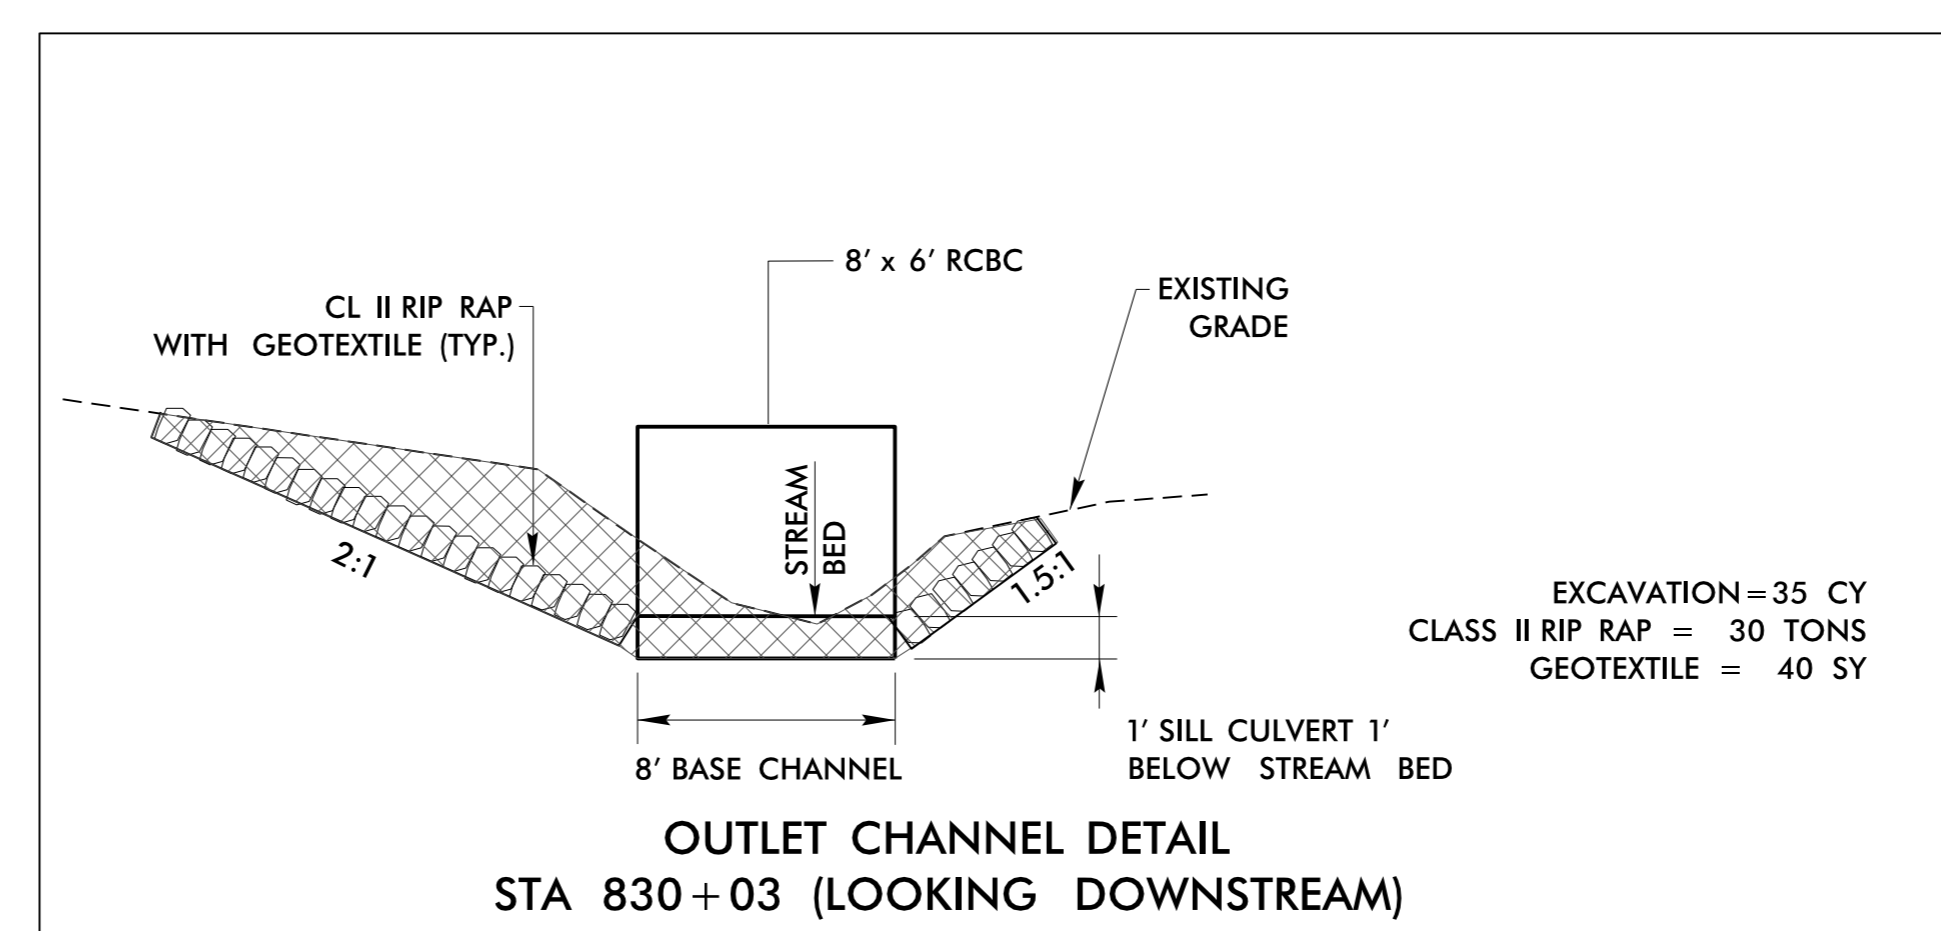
FLOODPLAIN BENCH OUTLET CHANNEL DETAIL
